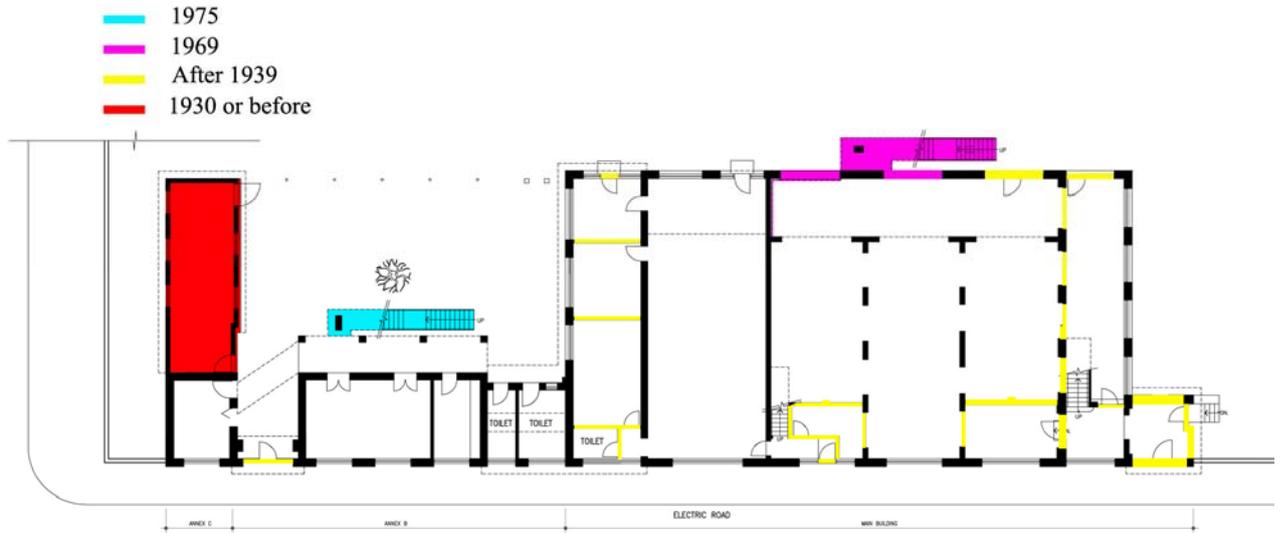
Possible ground floor plan of the former clubhouse at No. 12 Oil Street after the 1969-1975 conversion.
